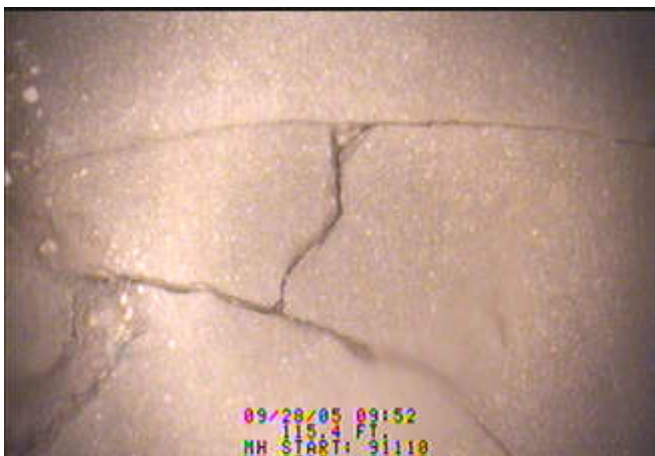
PHOTOS OF DETERIORATED RACE STREET STORM SEWER
